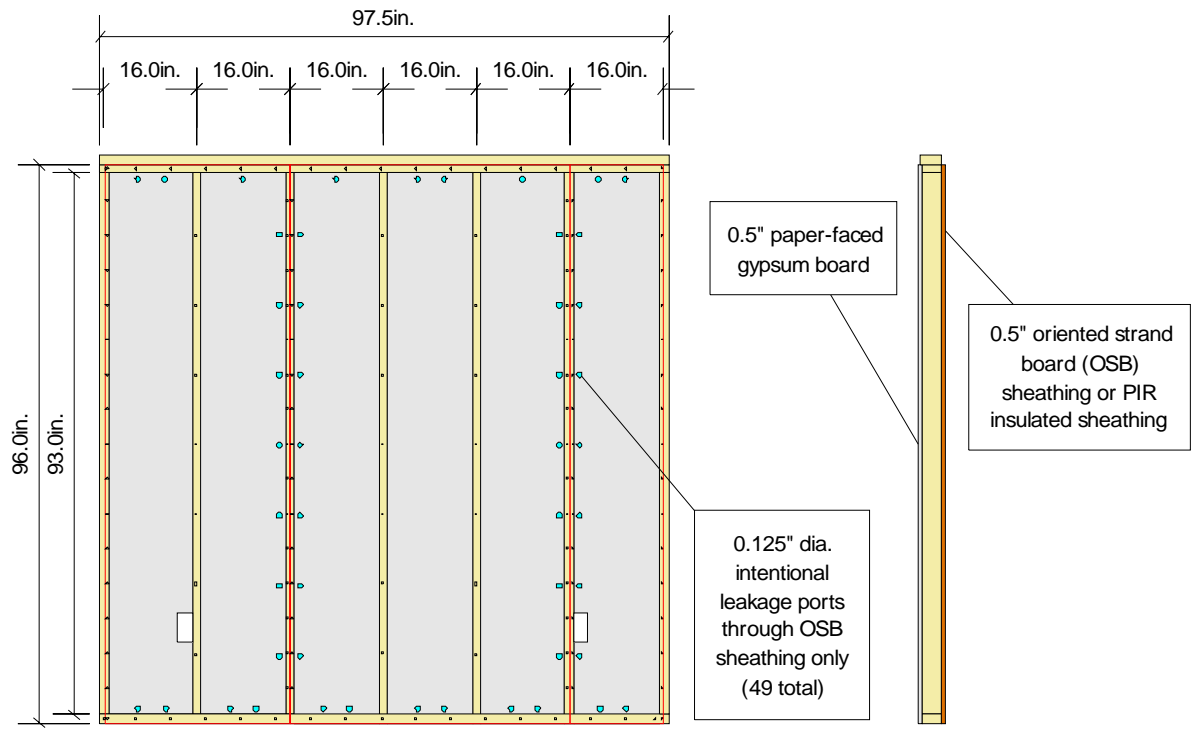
Detail of wall test specimen construction. Dimensions in inches (red outline shows perimeter of sheathing and gypsum board)
